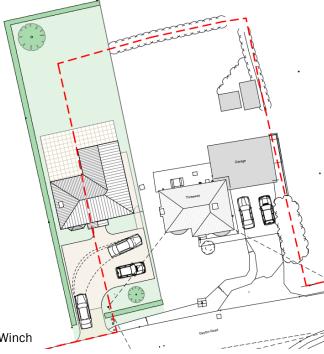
Proposed Site Plan overlaid with defined settlement boundary for East Winch
